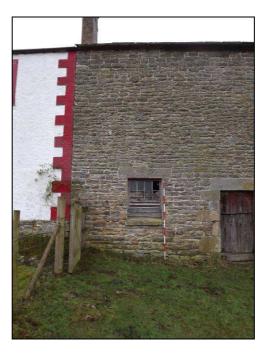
View looking north showing the house and agricultural building at Craig Hill
